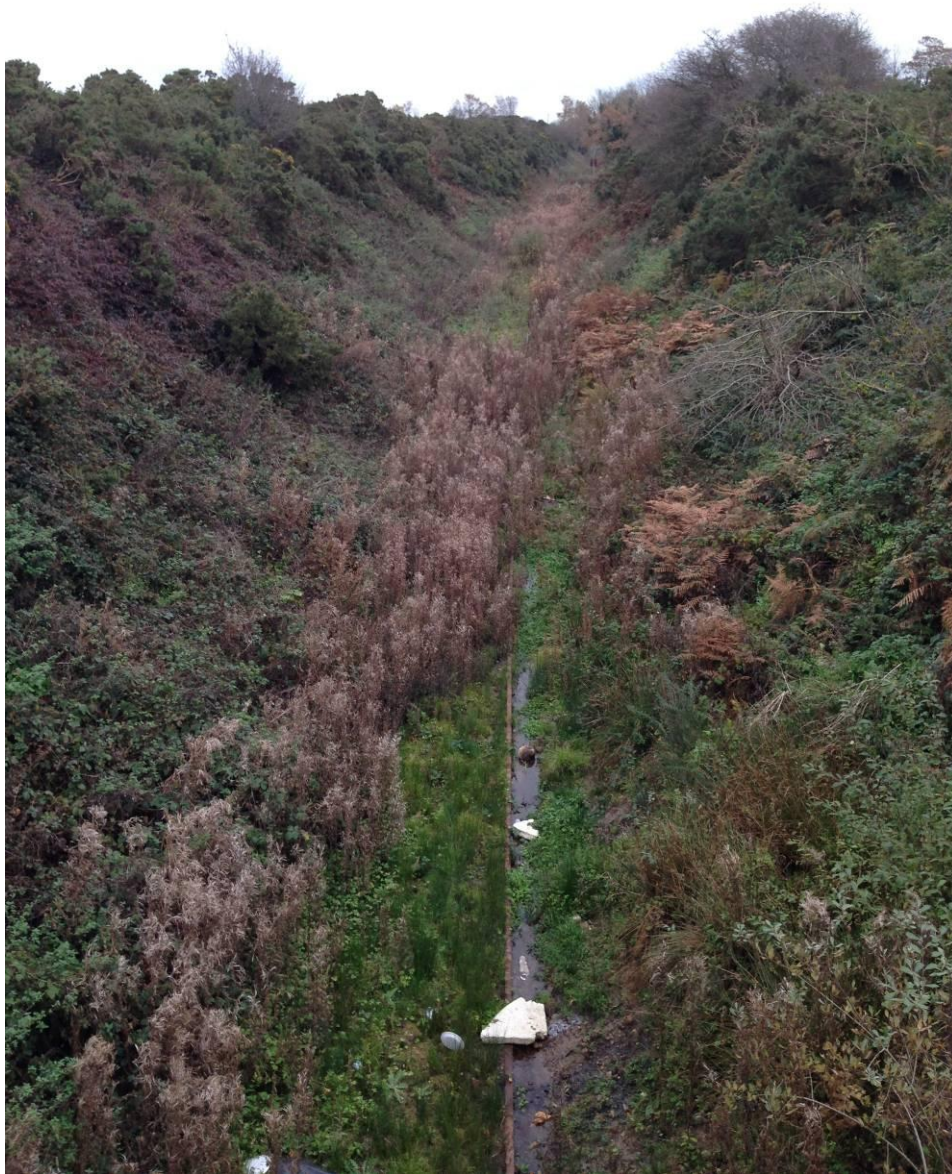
Looking north from OBJ 463 towards New Ross (Ch. 1+110)
